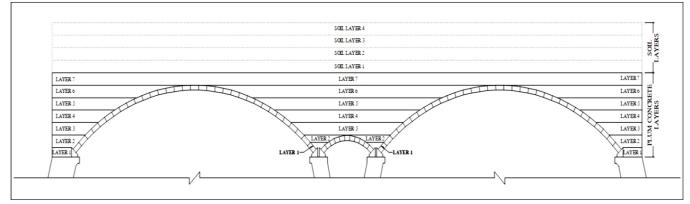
Construction Sequence of Arch Deck - Indicating Plum Concrete Backfilling in Layers.
